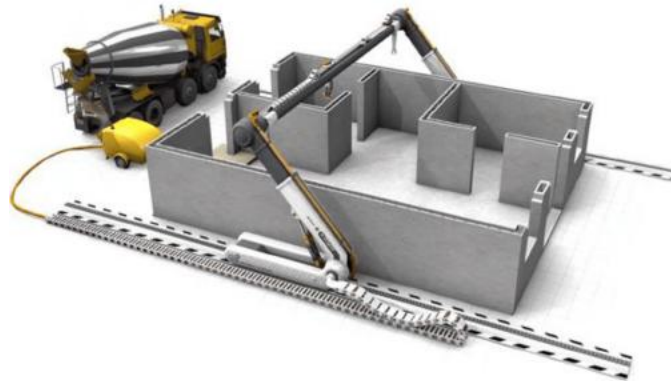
Construction of buildings using 3D-concrete printing (Lesovik et al., 2022)
